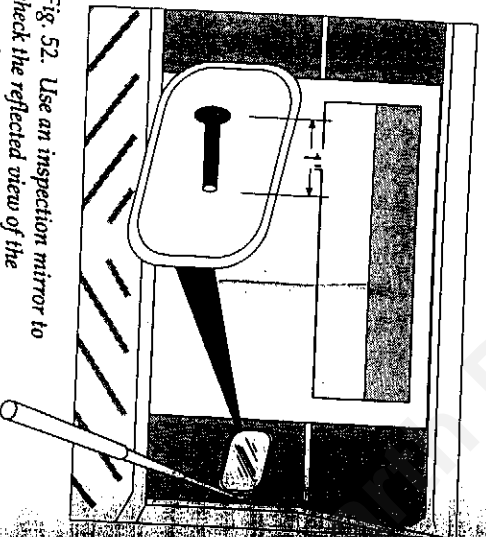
Use an inspection mirror to check the reflected view of the secondary probe.
